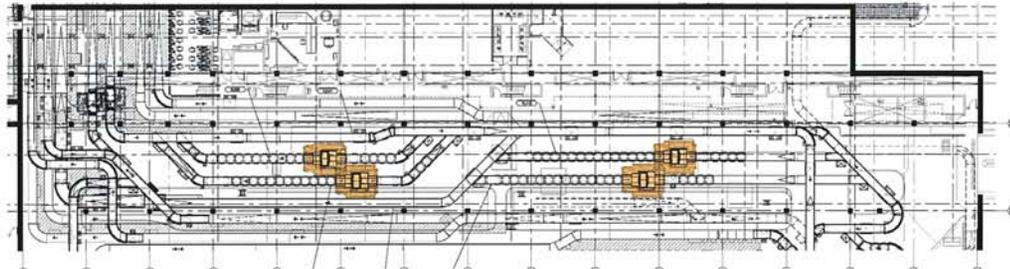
0 - Mezzanine Level Design - Option #3 - with BHS layout
